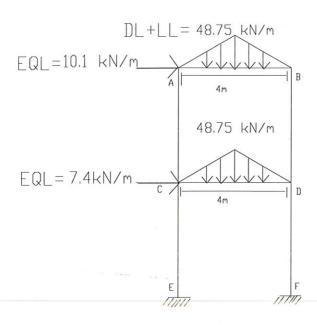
Loading Diagram for Earthquake, Live Load and Dead Loads
